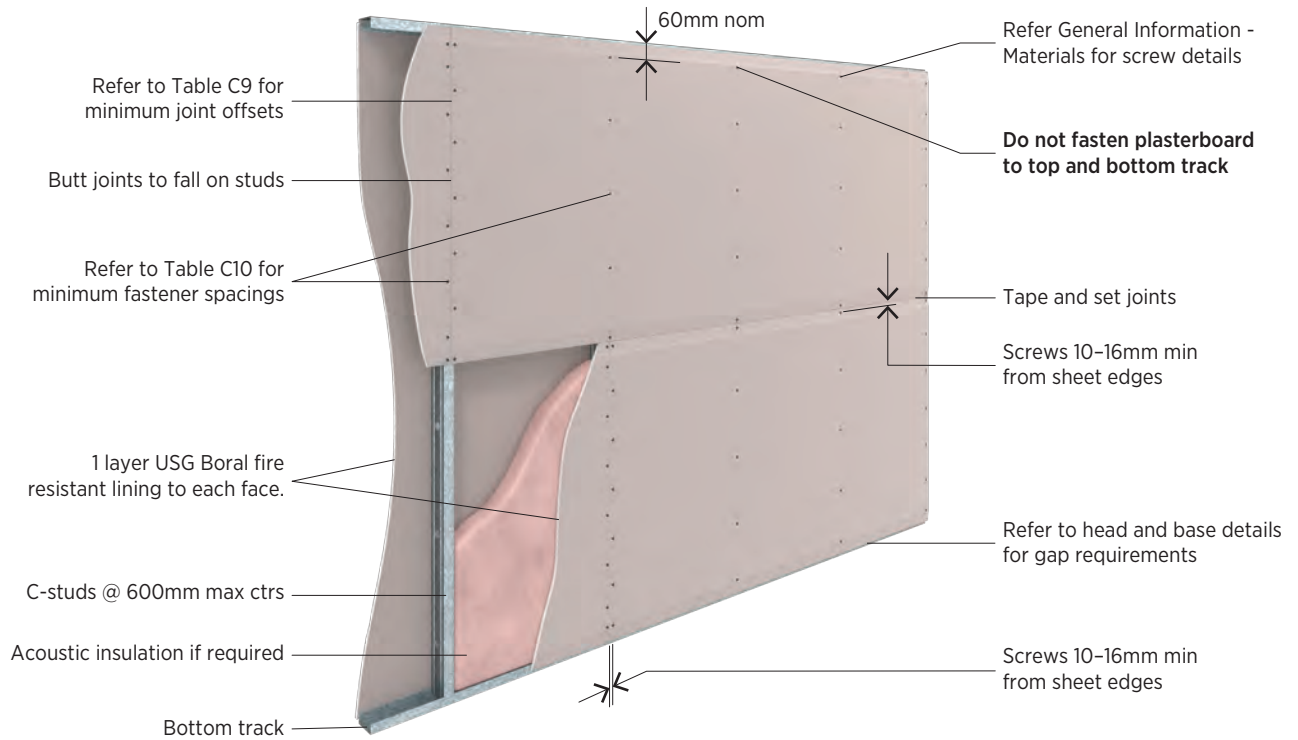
Fire Rated Steel Stud - Horizontal Fixing - Single Layer
